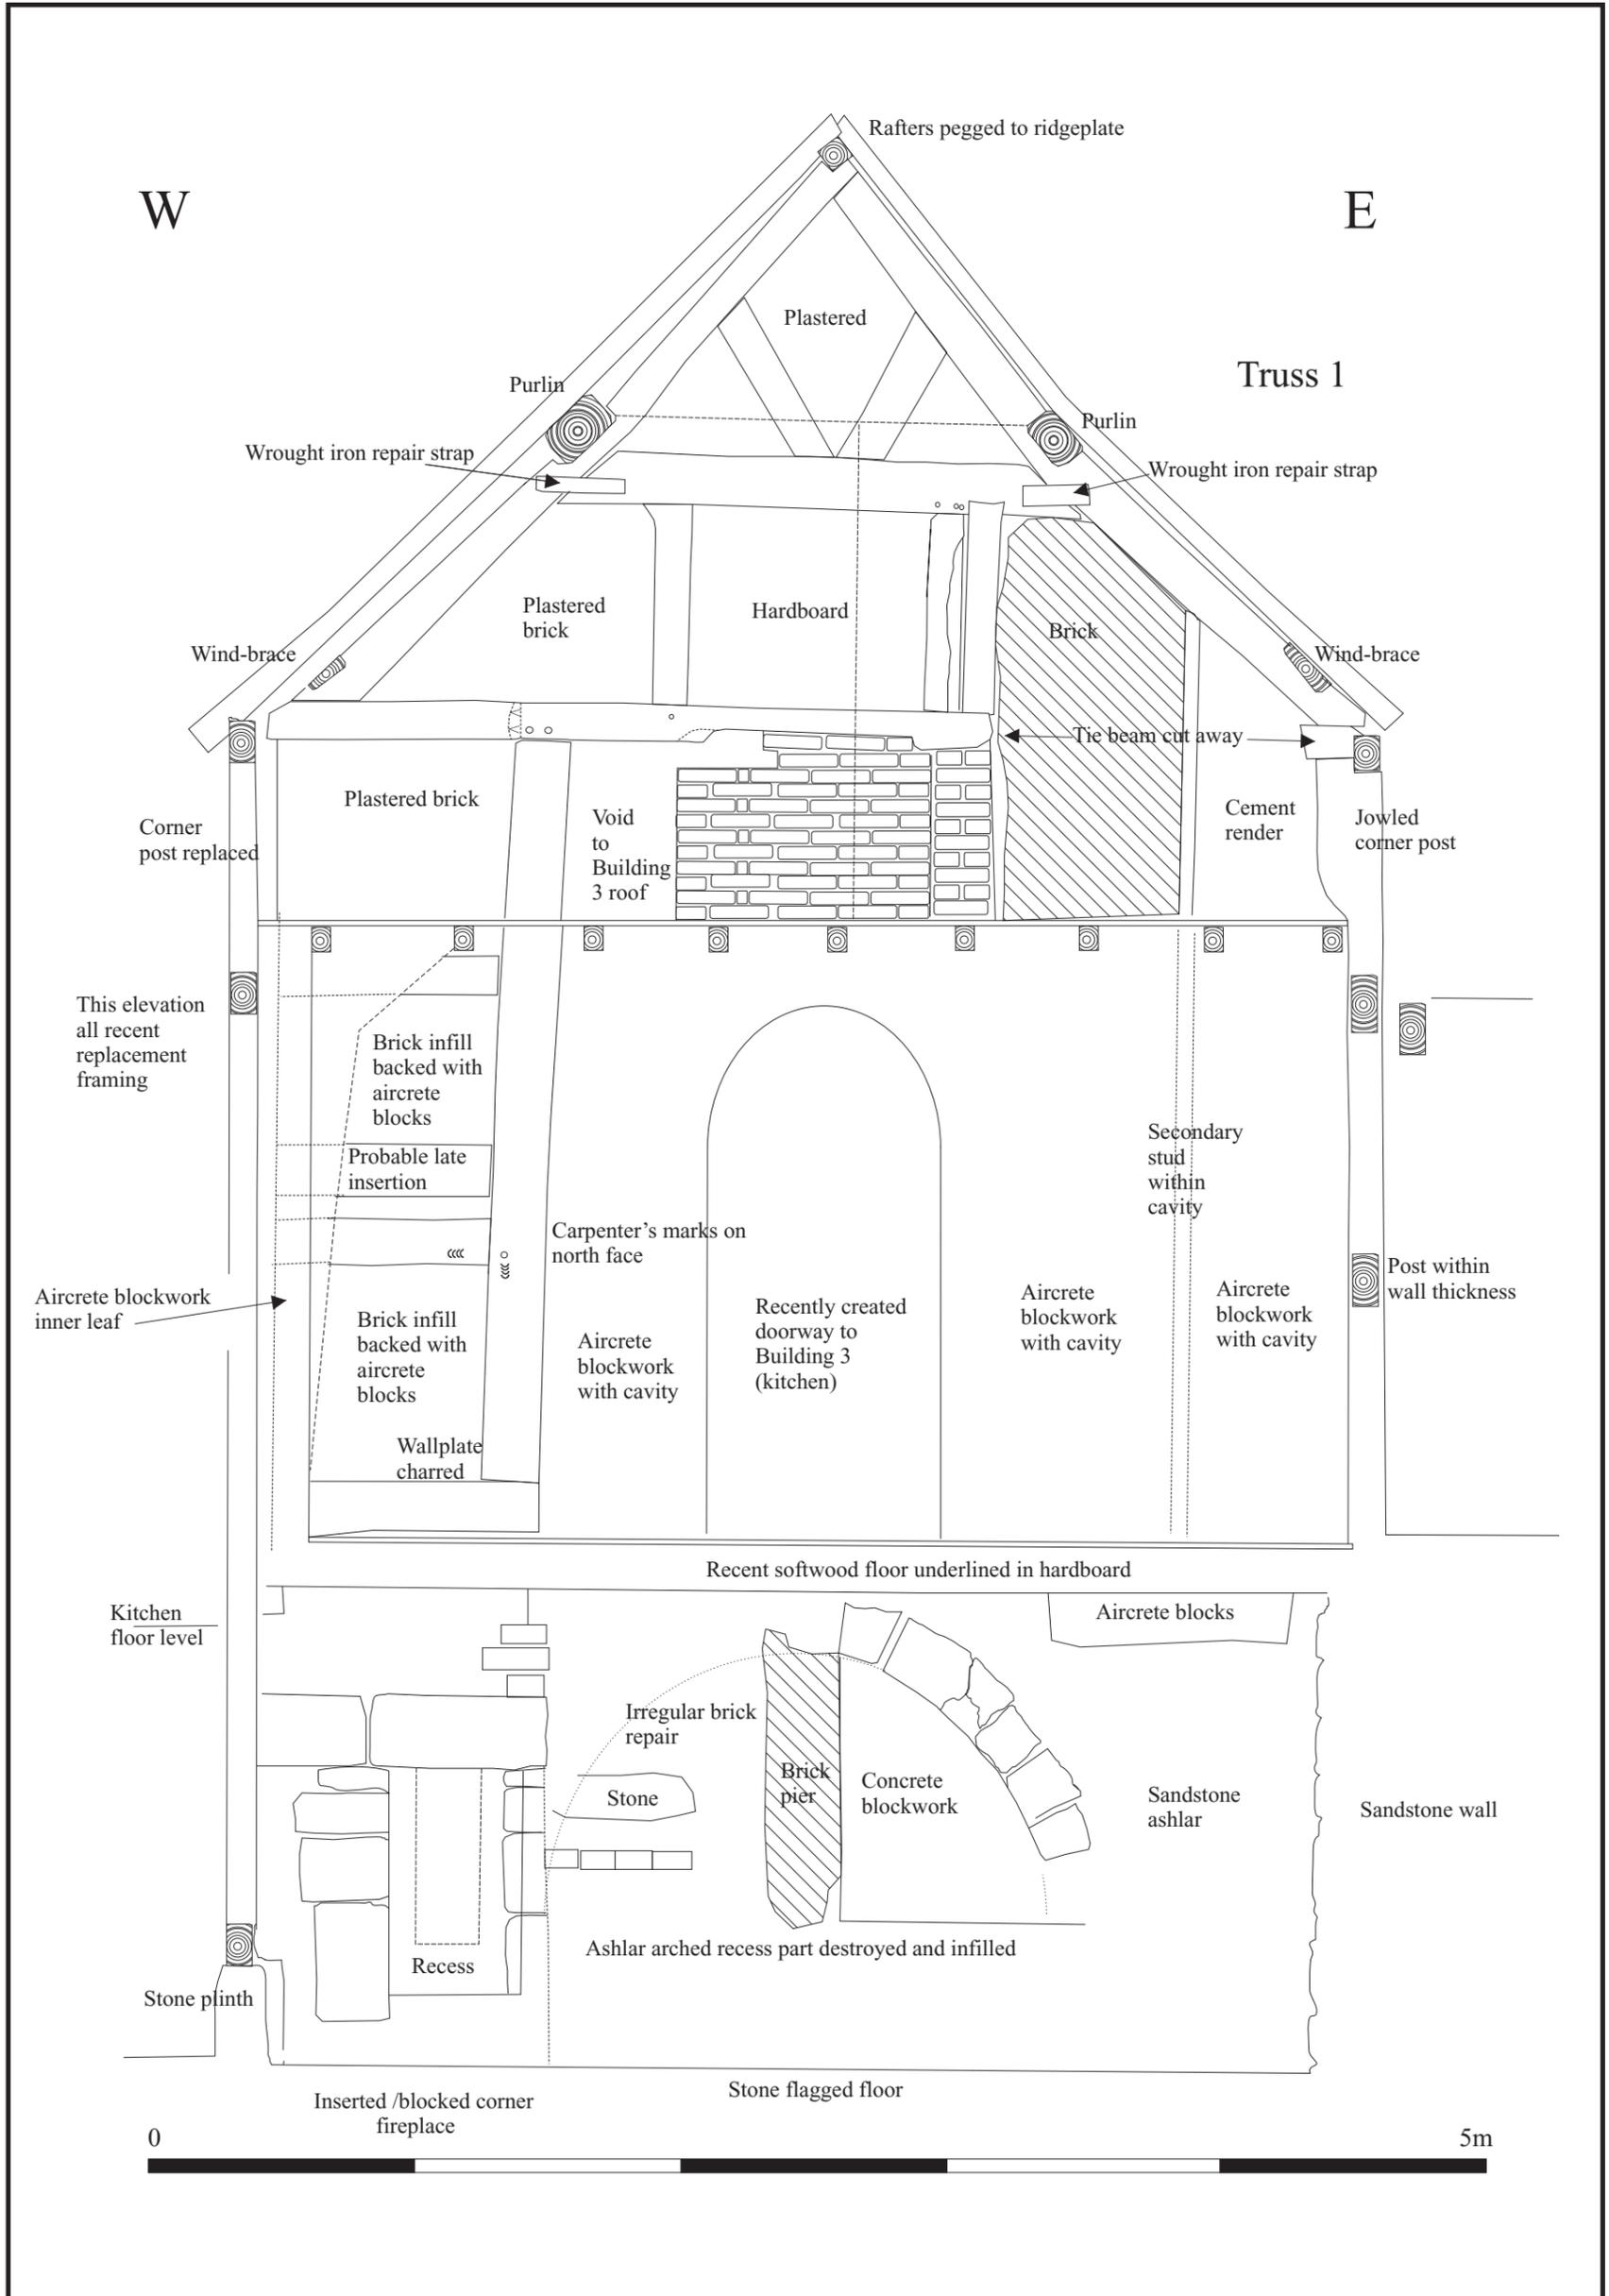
Composite internal elevation of northern wall of Building 1 (nb ground floor framing was only exposed from north)
